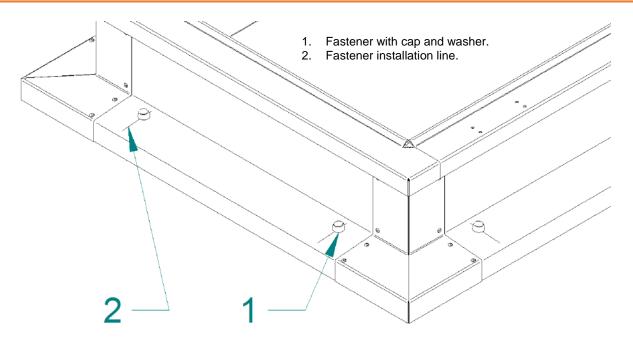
Installation of the mcr PROROOF roof access hatch with overlay base - fastener layout.
